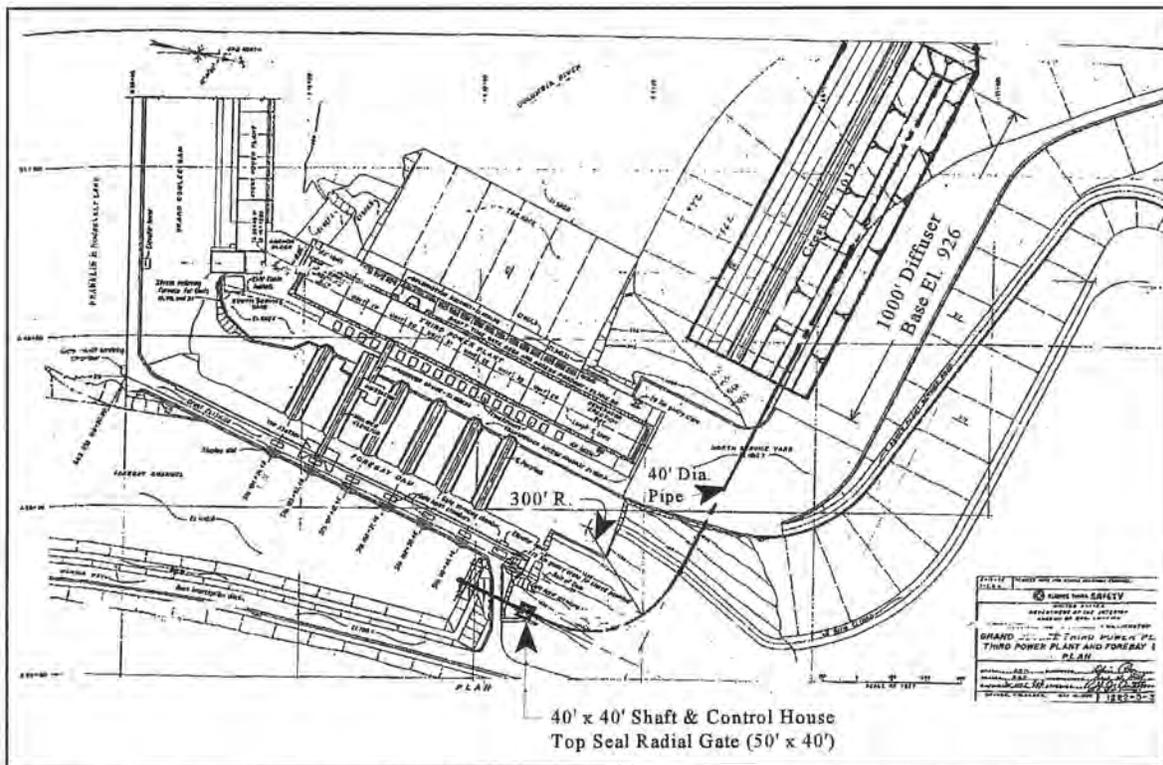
Plan view of the forebay cascade alternative No. 5 (fn:alter#5-2.wpg).
